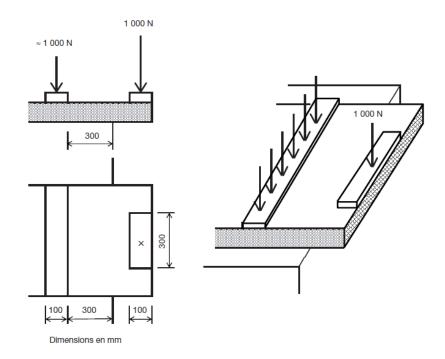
ARRANGEMENT OF THE TEST ON CANTILEVERED PARTS, INDICATING THE POSITIONING OF THE SPECIMEN
